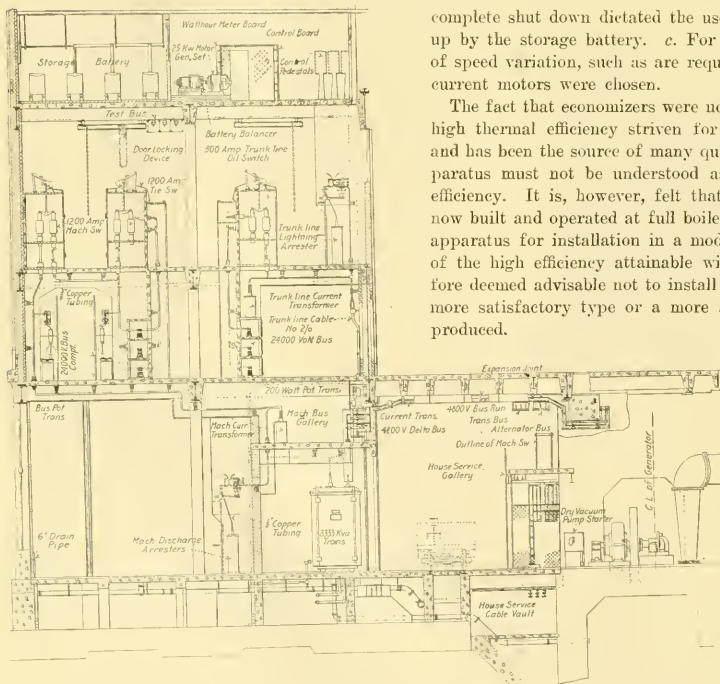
SECTIONAL VIEW THROUGH SWITCH HOUSE
